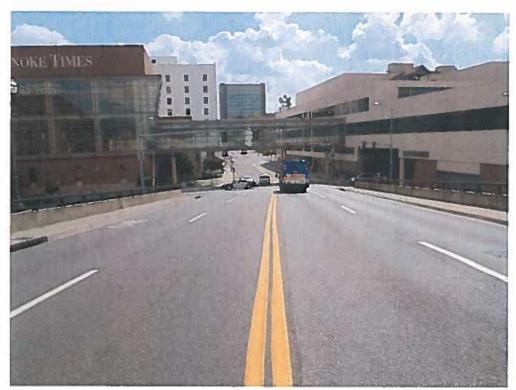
VIEW OF ROADWAY LOOKING SOUTH.
